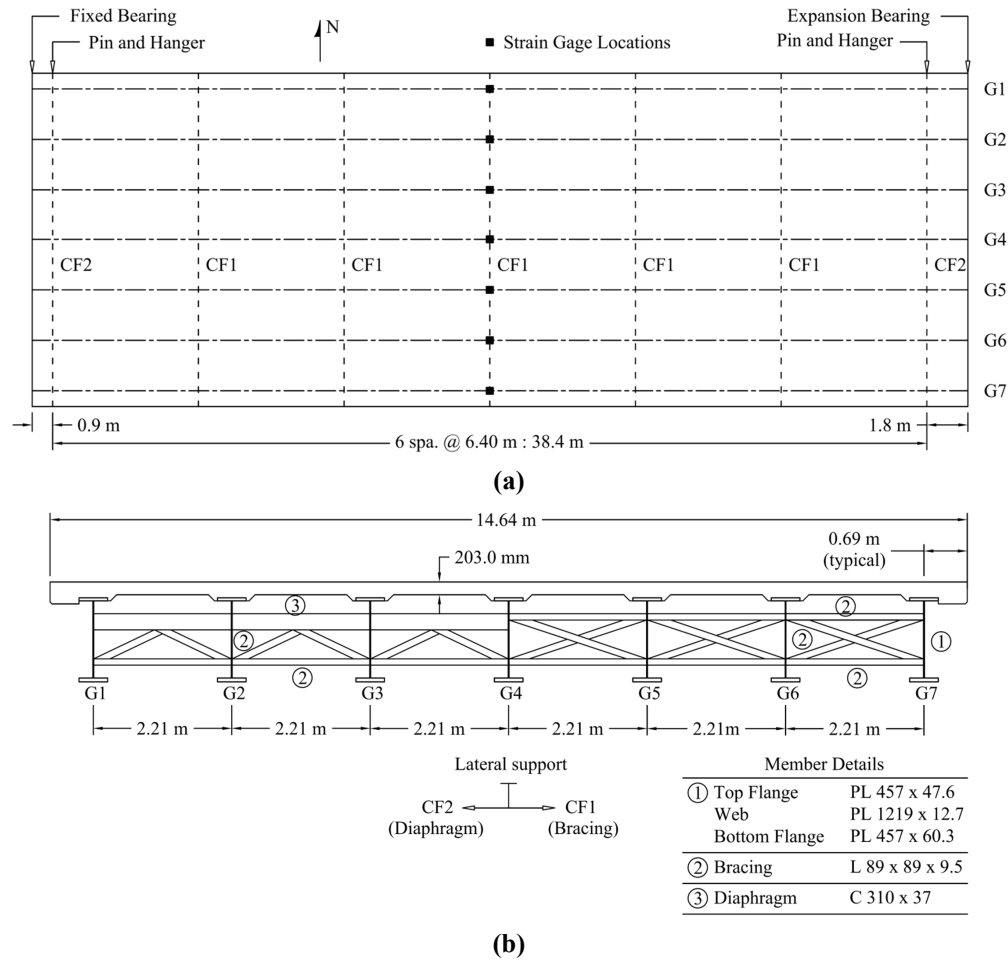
Stanley Bridge: (a) plan diagram (second span only), (b) cross-section diagram
